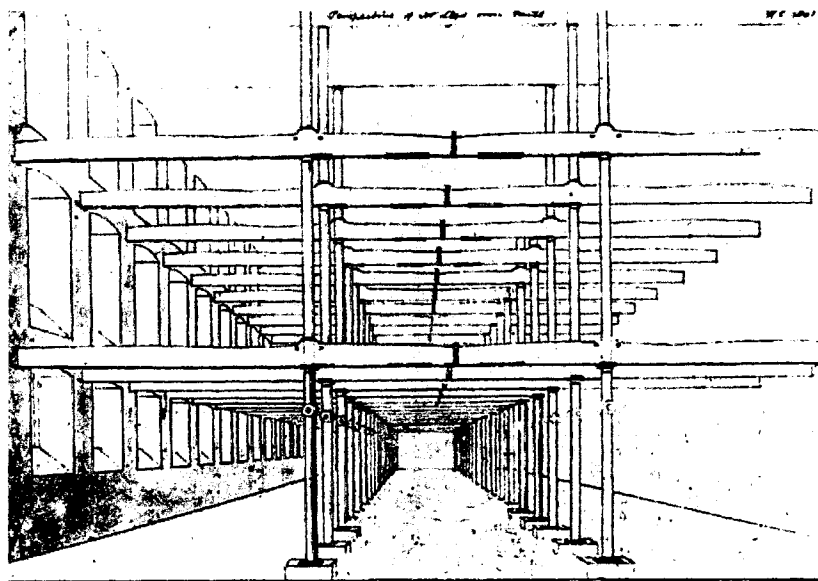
Internal skeleton of Mr. Lee's Iron Mill (1801). Brick-vaulted floors have been constructed between the cast iron columns and girders, while the outer walls are also made of masonry
